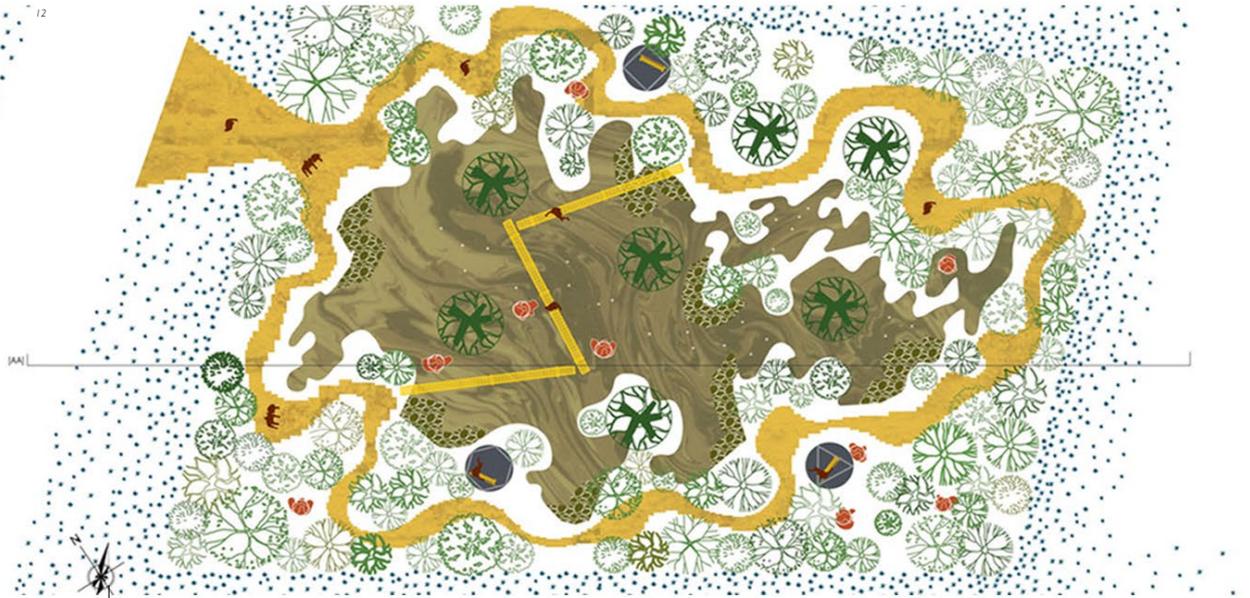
, page36, Yellow Mud Garden site plan, site SLA.
